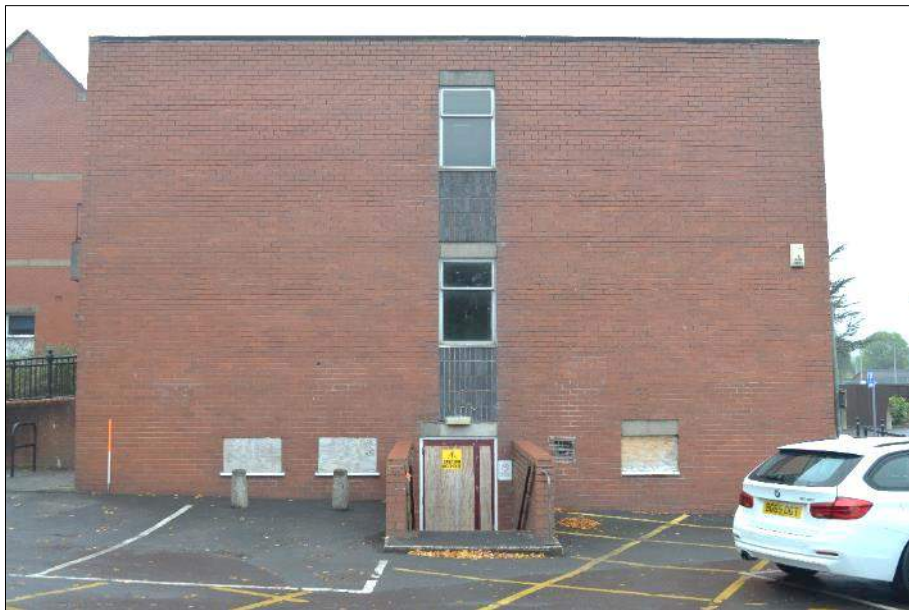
(shot 29): South elevation of 1960's extension looking north, scale 1m
